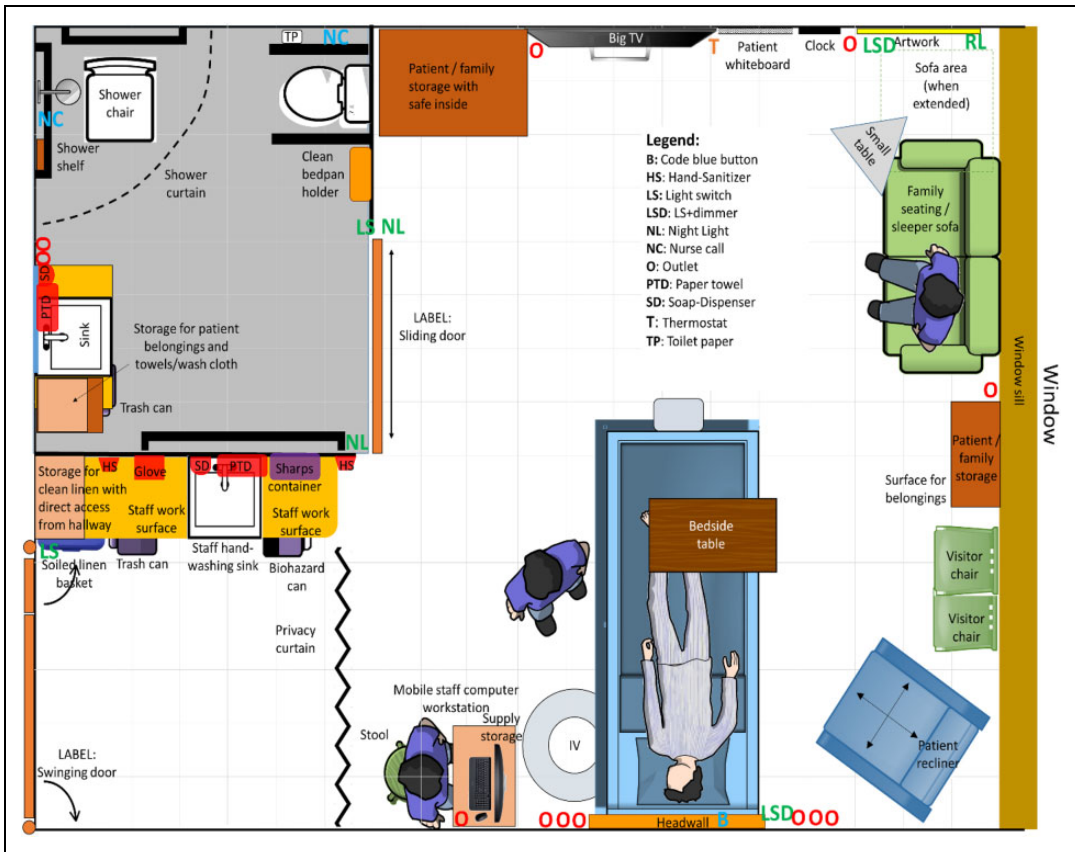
The hybrid design based on four room layouts where the bed is located across from an inboard bathroom.
